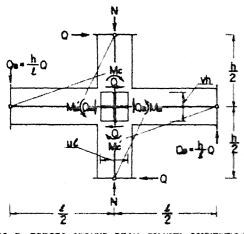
FORCES AROUND BEAM-COLUMN CONNECTION
